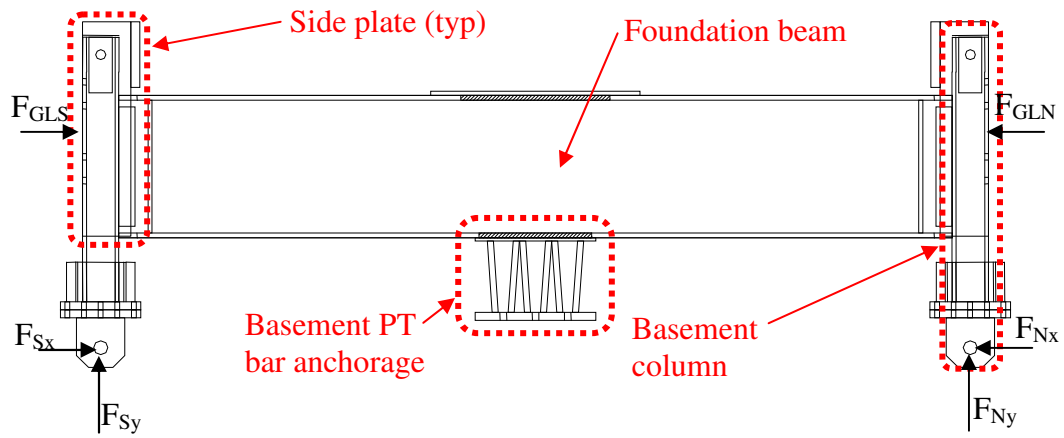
Drawing of basement substructure of SC-CBF test structure
